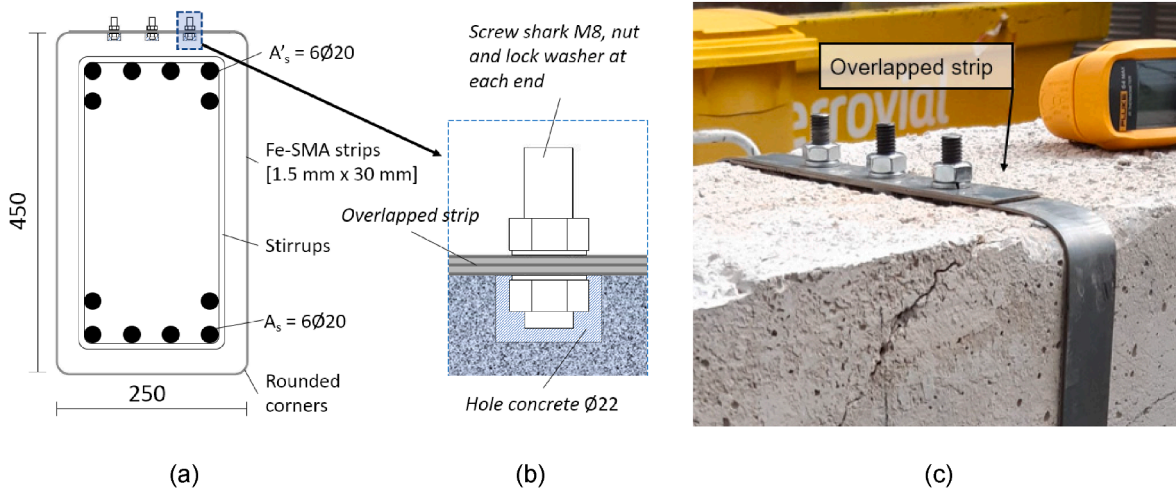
Full-wrapped strengthening system. (a) cross-section of the RC beam (dimensions in mm); (b) detail of the anchoring system; (c) photography of the anchorage system.
